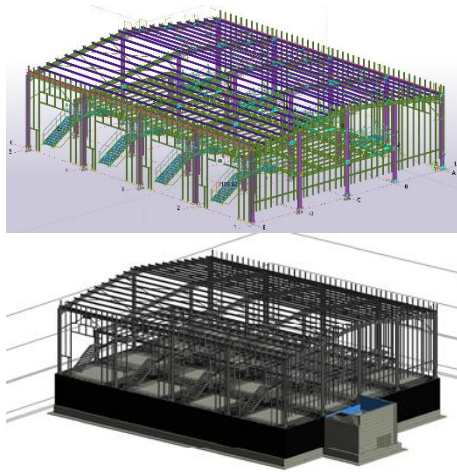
Steel Construction 3D-BIM Model and Transfer from Tekla Structures to Revit.
